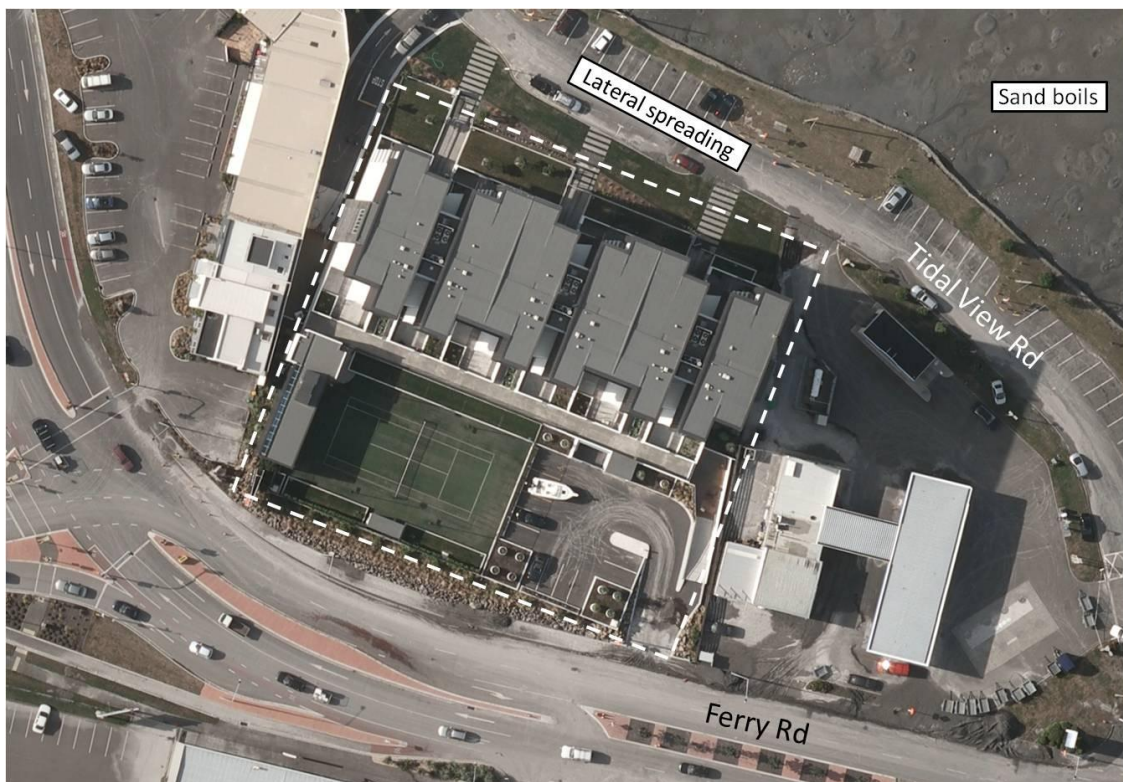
Aerial view of Ferrymead apartment building indicating surrounding ejected material (LINZ 2011). (-43.5577° , 172.7066°)
